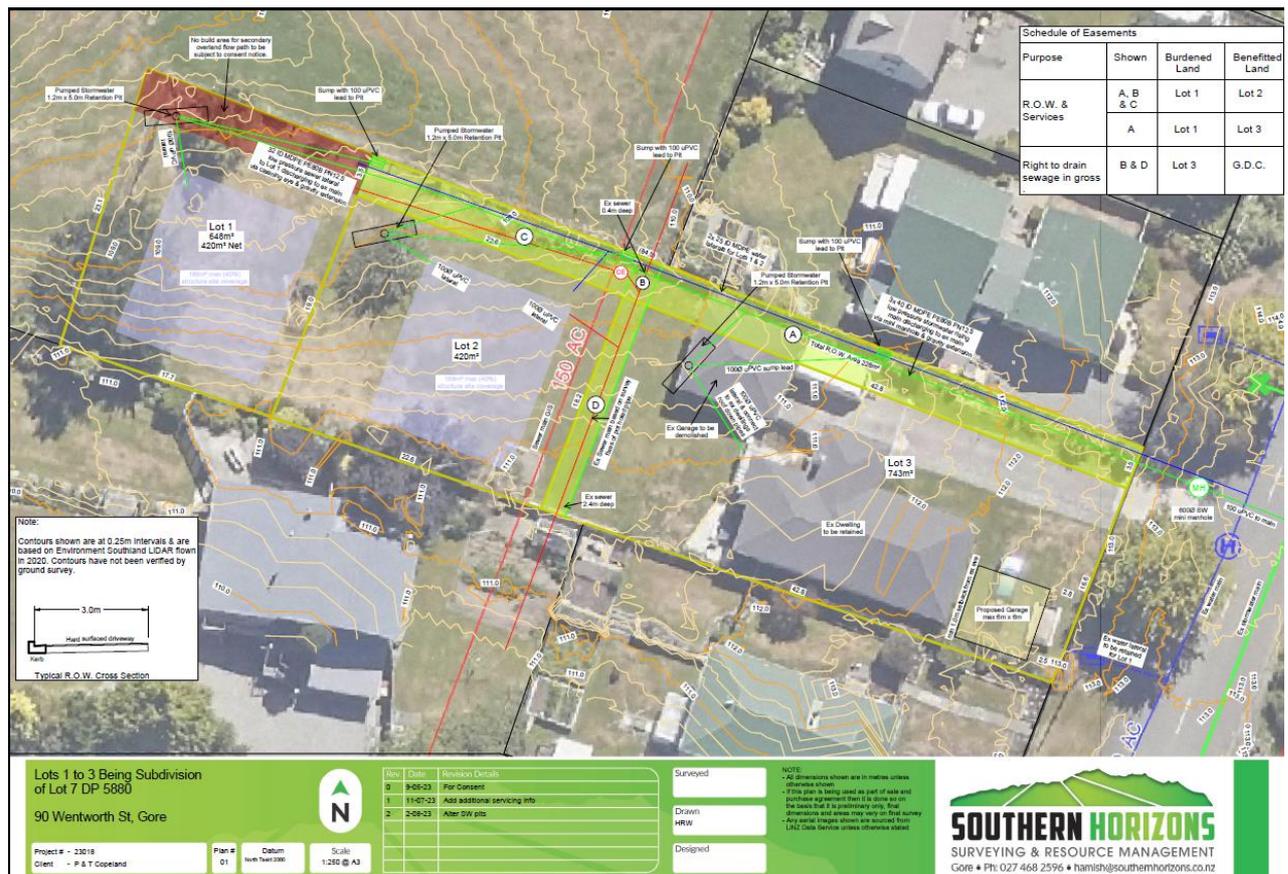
Scheme Plan of proposed subdivision (Source: Southern Horizons).
